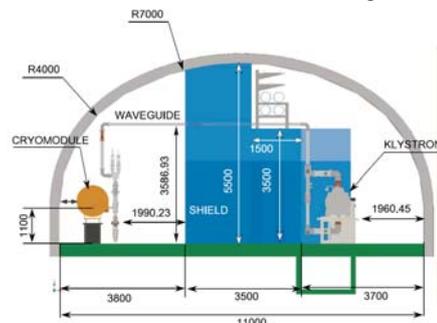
Cross section view of Kamaboko tunnel and layout of DKS.
